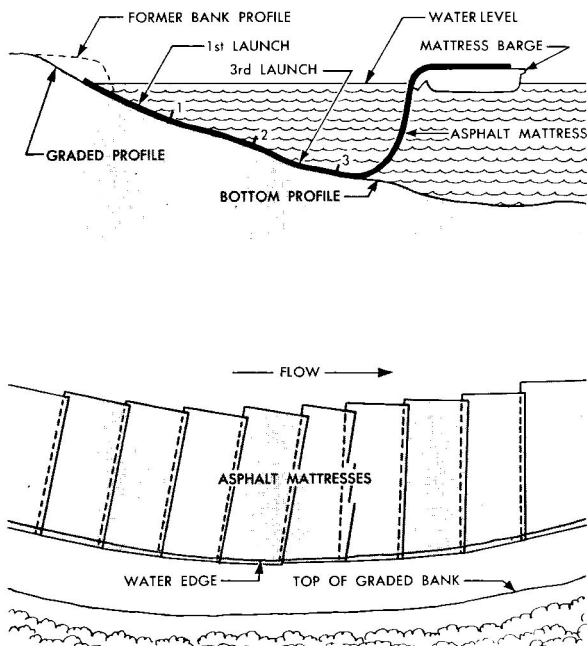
General Layout Reinforced Asphalt Mattress (Subaqueous)
